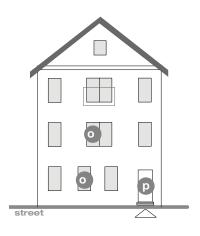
(3): Transparency and Building Entrance Requirements.
